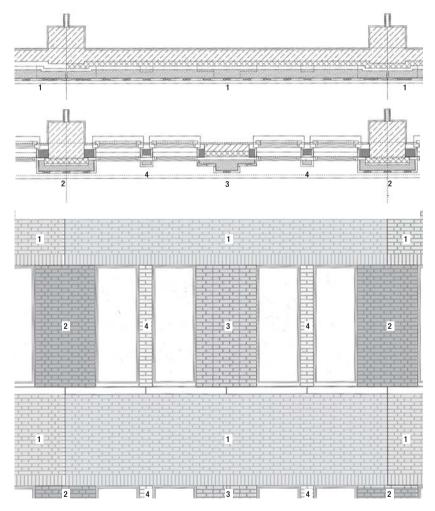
Details of facade cladding to block: horizontal section through spandrel panel, horizontal section through windows, and elevation on windows and spandrel panel showing individual prefabricated parts and joints: 1 spandrel panel element, 2 column cladding, 3 lesene, 4 mullion
